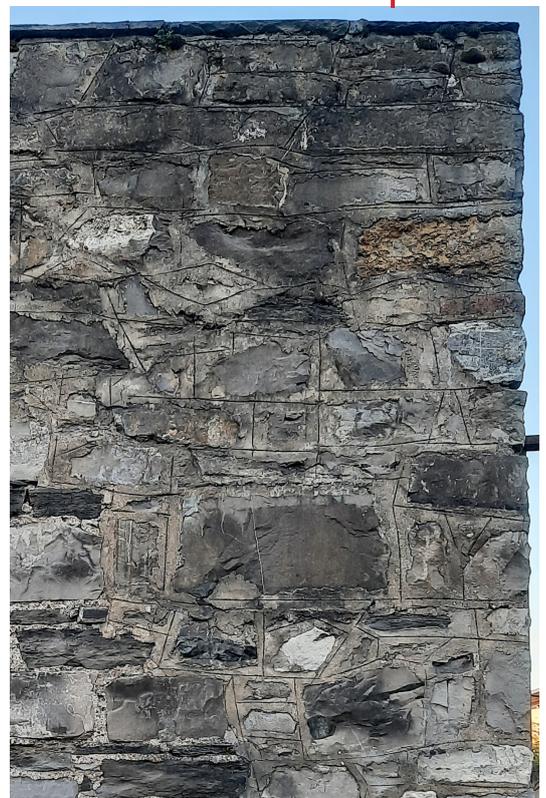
Section of rebuilt masonry with cementitious mortar
